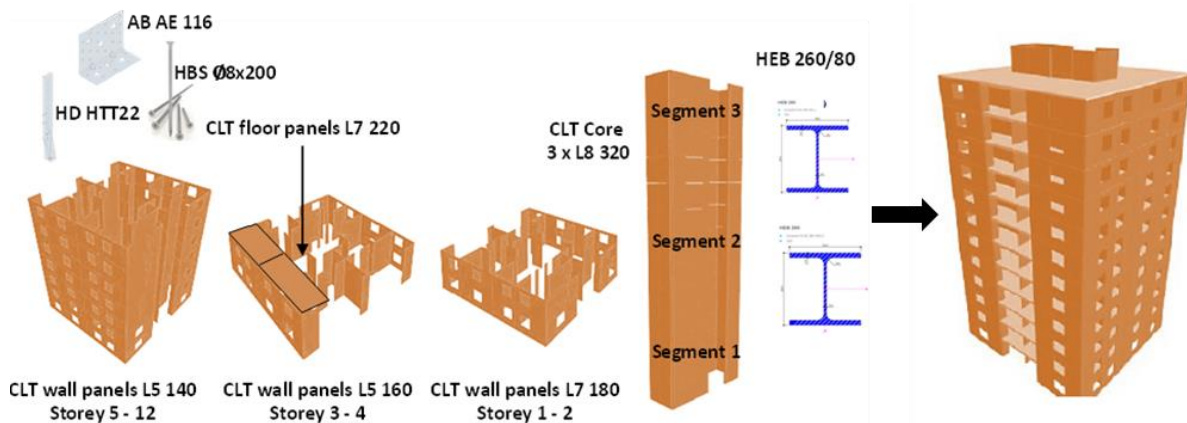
Final sizes of structural elements, CLT wall and floor panels type, CLT core segments and connection types considered for the design & seismic analysis of the case study building.
